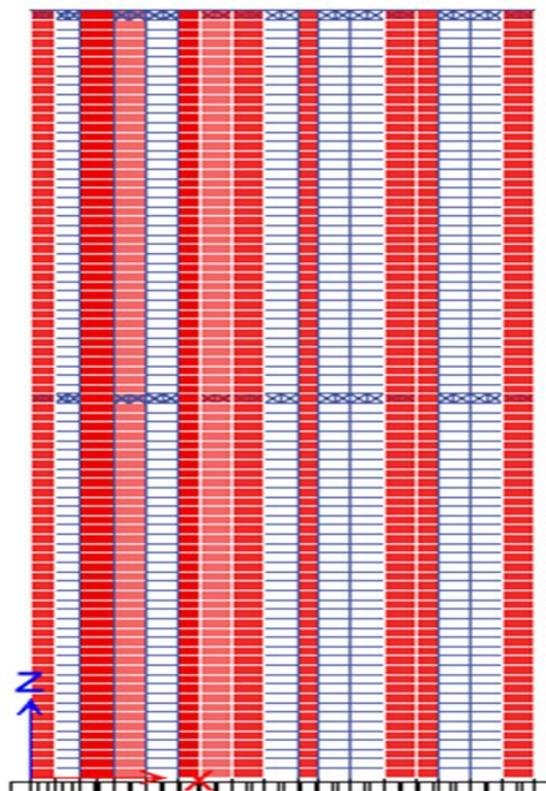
ELEVATION (MODEL NO 5- OUTRIGGER AT TOP & 0.5H i.e. HEIGHT OF BUILDING)
